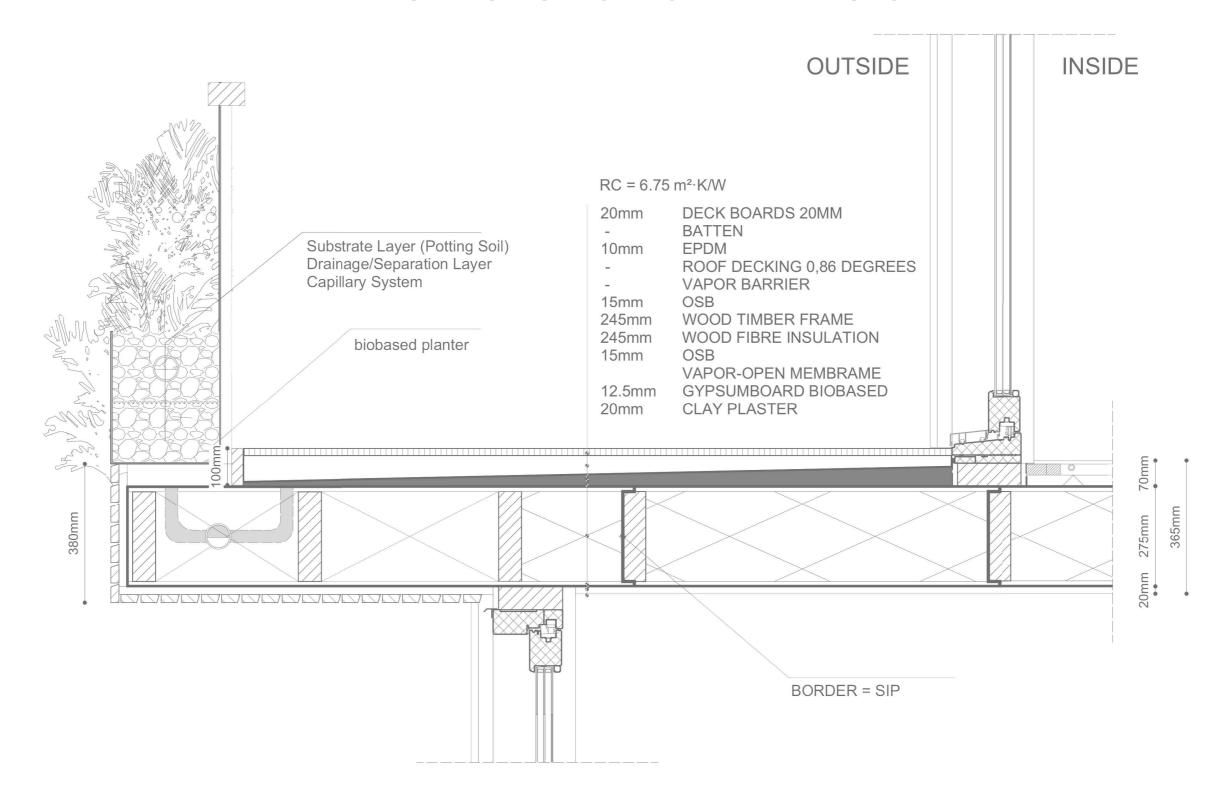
10VERTICAL SECTION EXISTING AND EXTENSION
